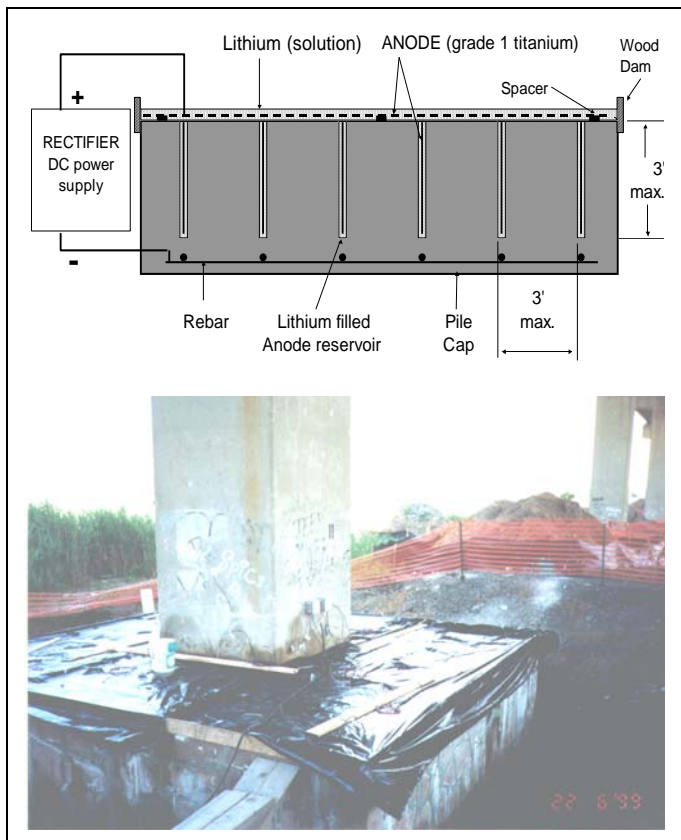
(A & B). Repair of pier footings of a highway structure suffering from severe cracking and spalling due to ASR using an electrochemical system for lithium impregnation (Pictures A & B: courtesy of D. Whitmore, Vector Construction Group, Winnipeg, Canada).
